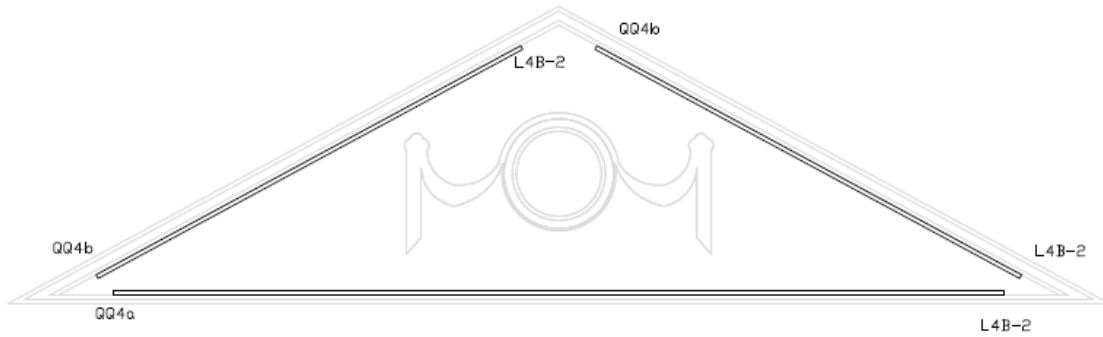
Pediment Lighting Layout – Fixture QQ4
